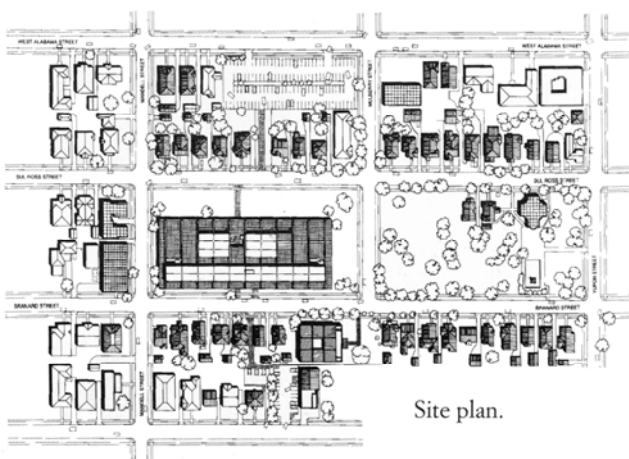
Menil Museum, Site Plan. (Piano, p.15)
